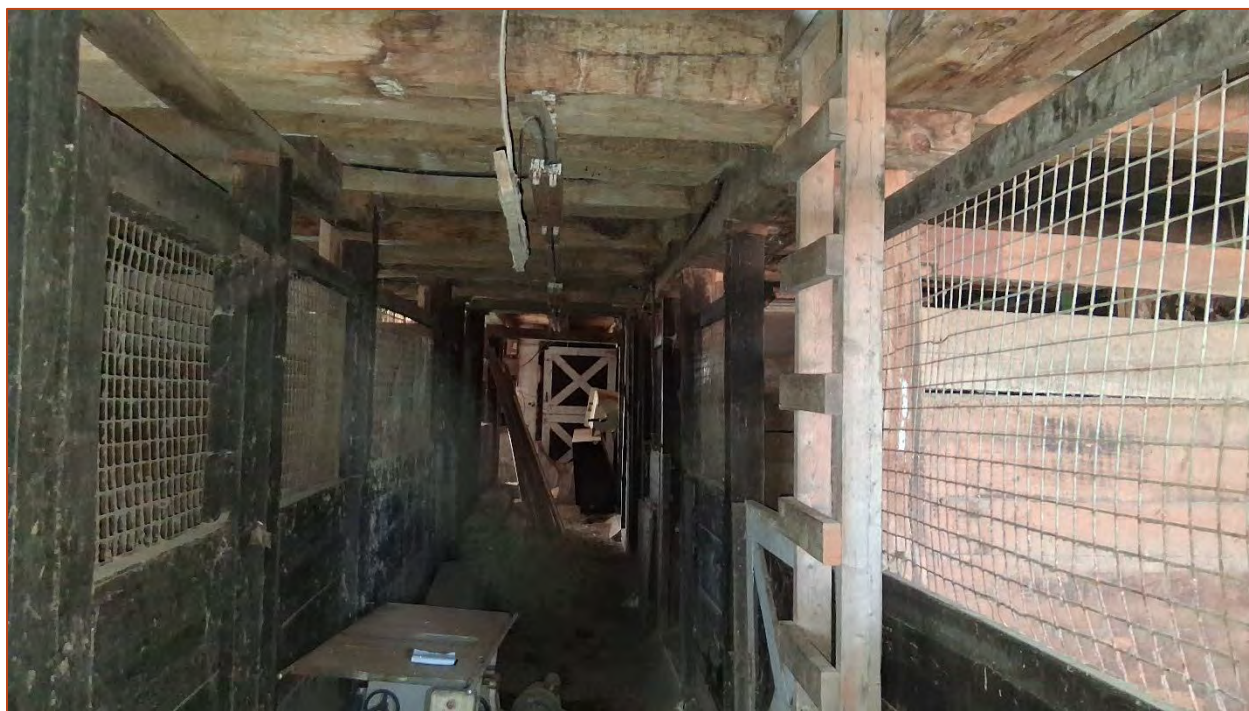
Interior view of an aisle with livestock stalls or pens on both sides.
